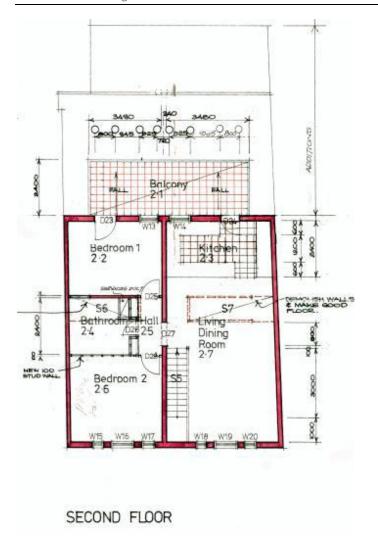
139–141 George Street, Proposed Renovations, Stage 1, January 1978, Second Floor. The area of the two bedroom apartment shown in this plan is now occupied by spaces 2.24 (Room 17), 2.26 (Room 18) 2.19 (hallway), 2.25 and 2.27 of The Russell Hotel. Part of the rear (western) wall shaded red in this plan (adjacent to the balcony) probably survives in the western wall of hallway 2.19. Source: PMNSW Drawing No. HP-9-1.
